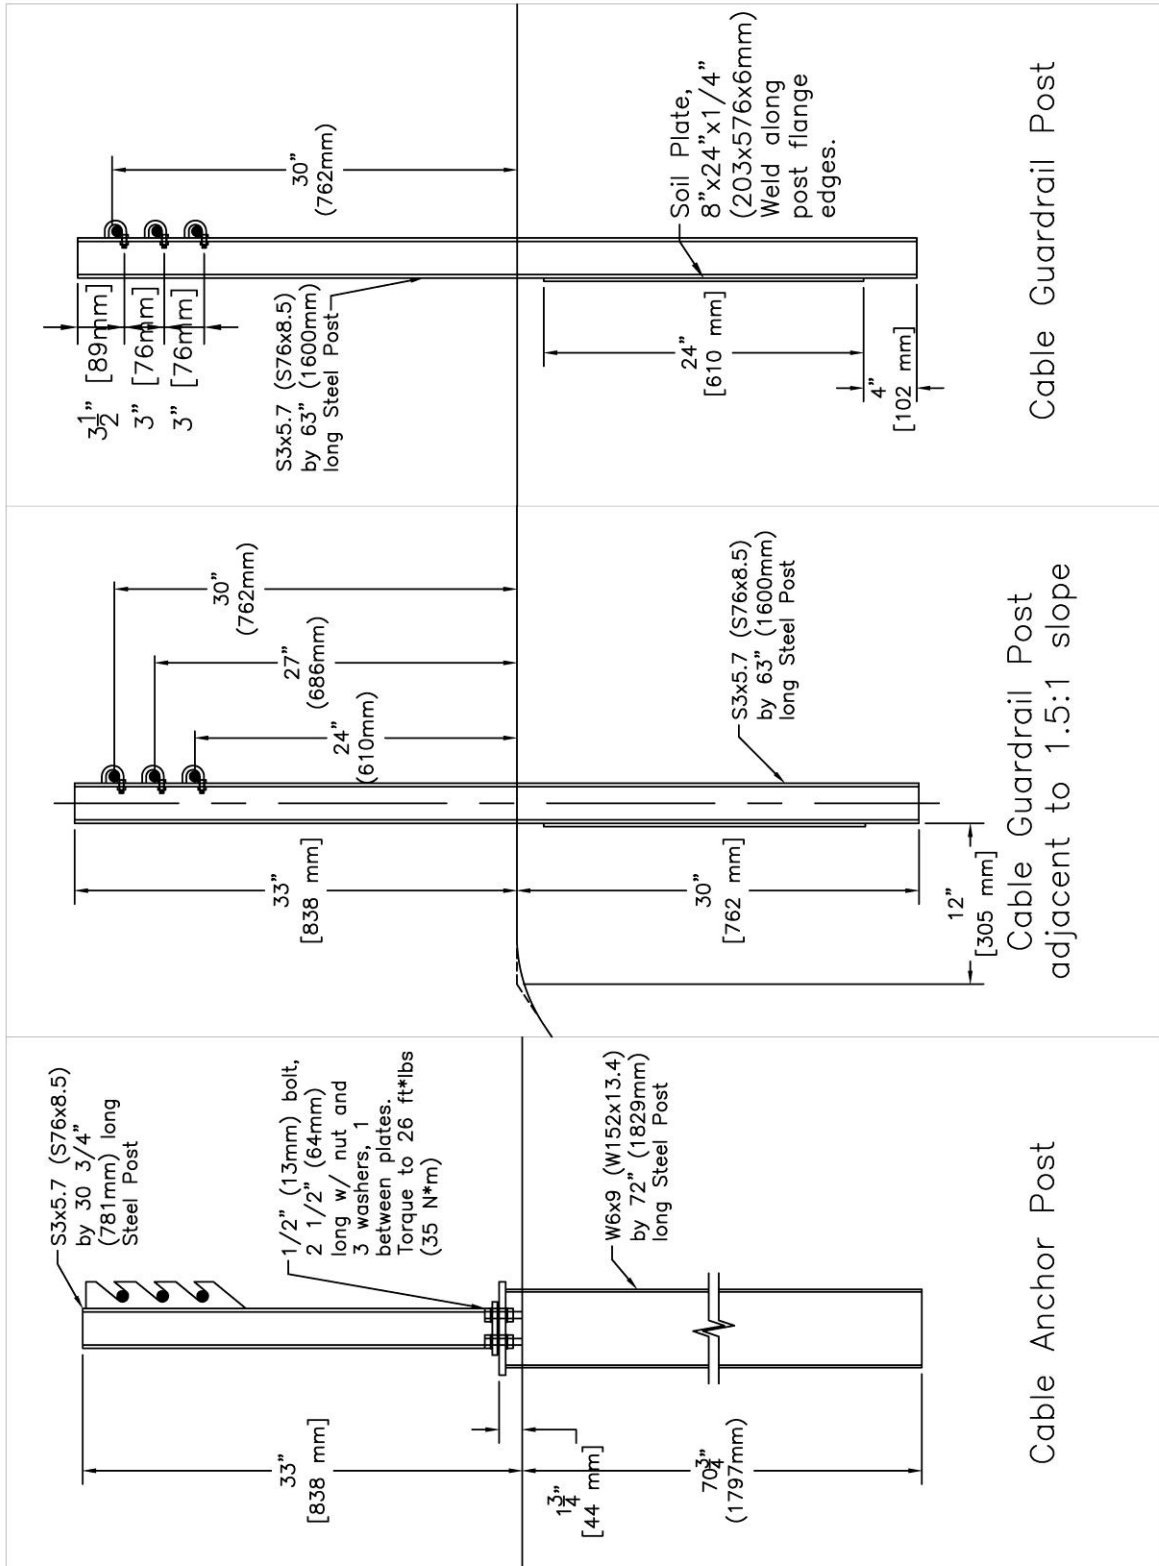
Anchor Post Details, Test No. CS-1 [44]
